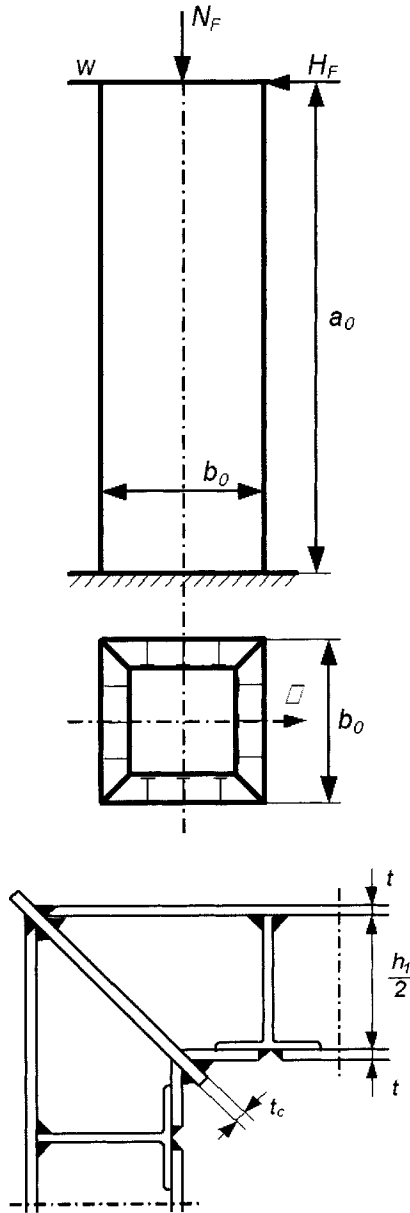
A cantilever stub-column of square box section with cellular side plates and the welded corner
